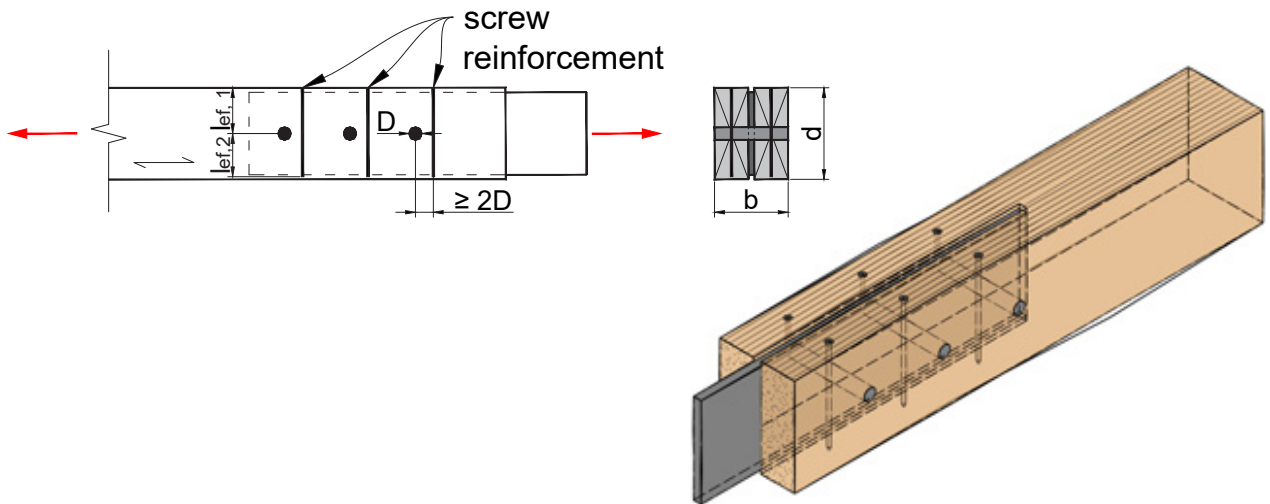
Reinforcement of a connection with multiple dowel type fasteners in one row.
